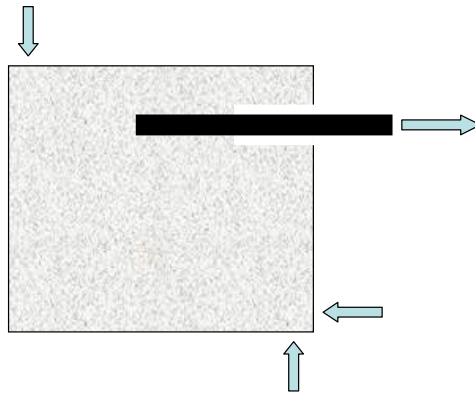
Schematic of beam-end test (adapted from ACI 408)
